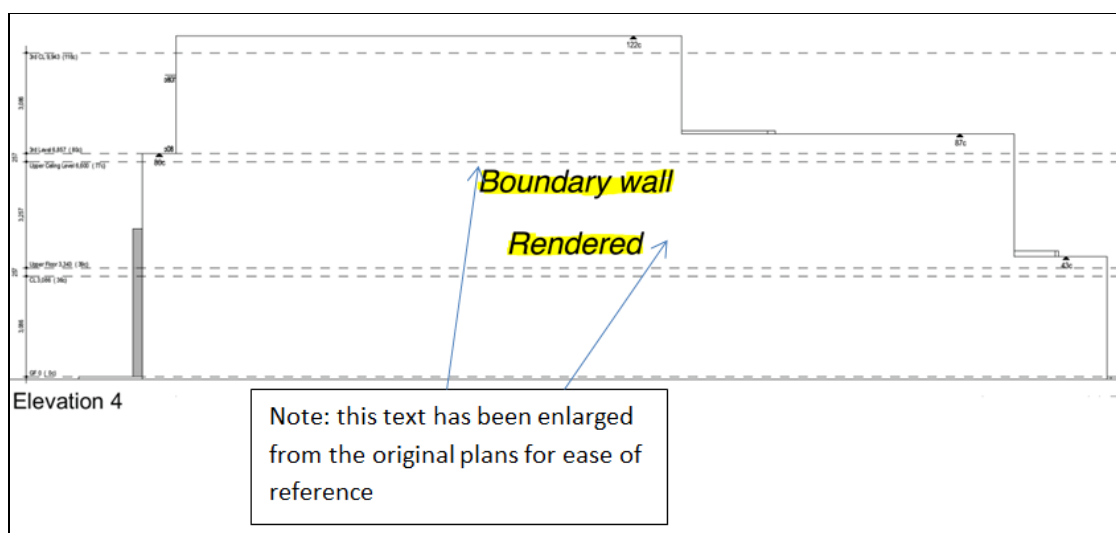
Elevation 4 as submitted to the Developer/ Developers Architect.
